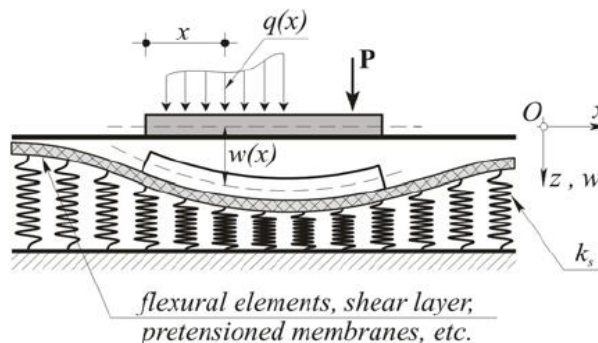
BEAM ON ELASTIC FOUNDATION
